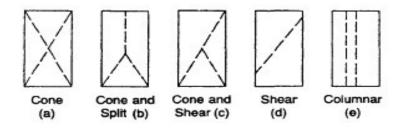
Concrete Specimen Failure Types (American Concrete Institute 2016)
